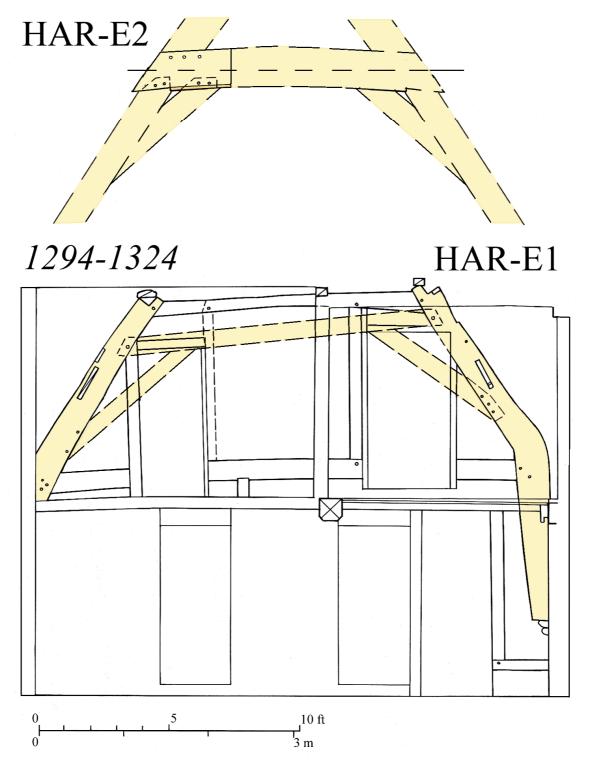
Section of truss T1. Top: collar and reconstruction of Truss 2.
